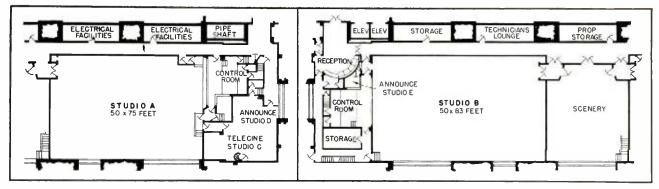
Partial floor plan of Studio A, film-projection studio, FIG. 2—Simplified floor plan of Studio B, control, announce Studio control room and other facilities
